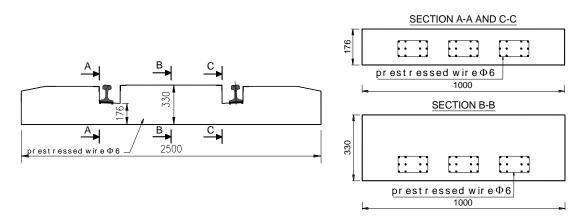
Cross-section of track slab (dimensions are in millimeters)
